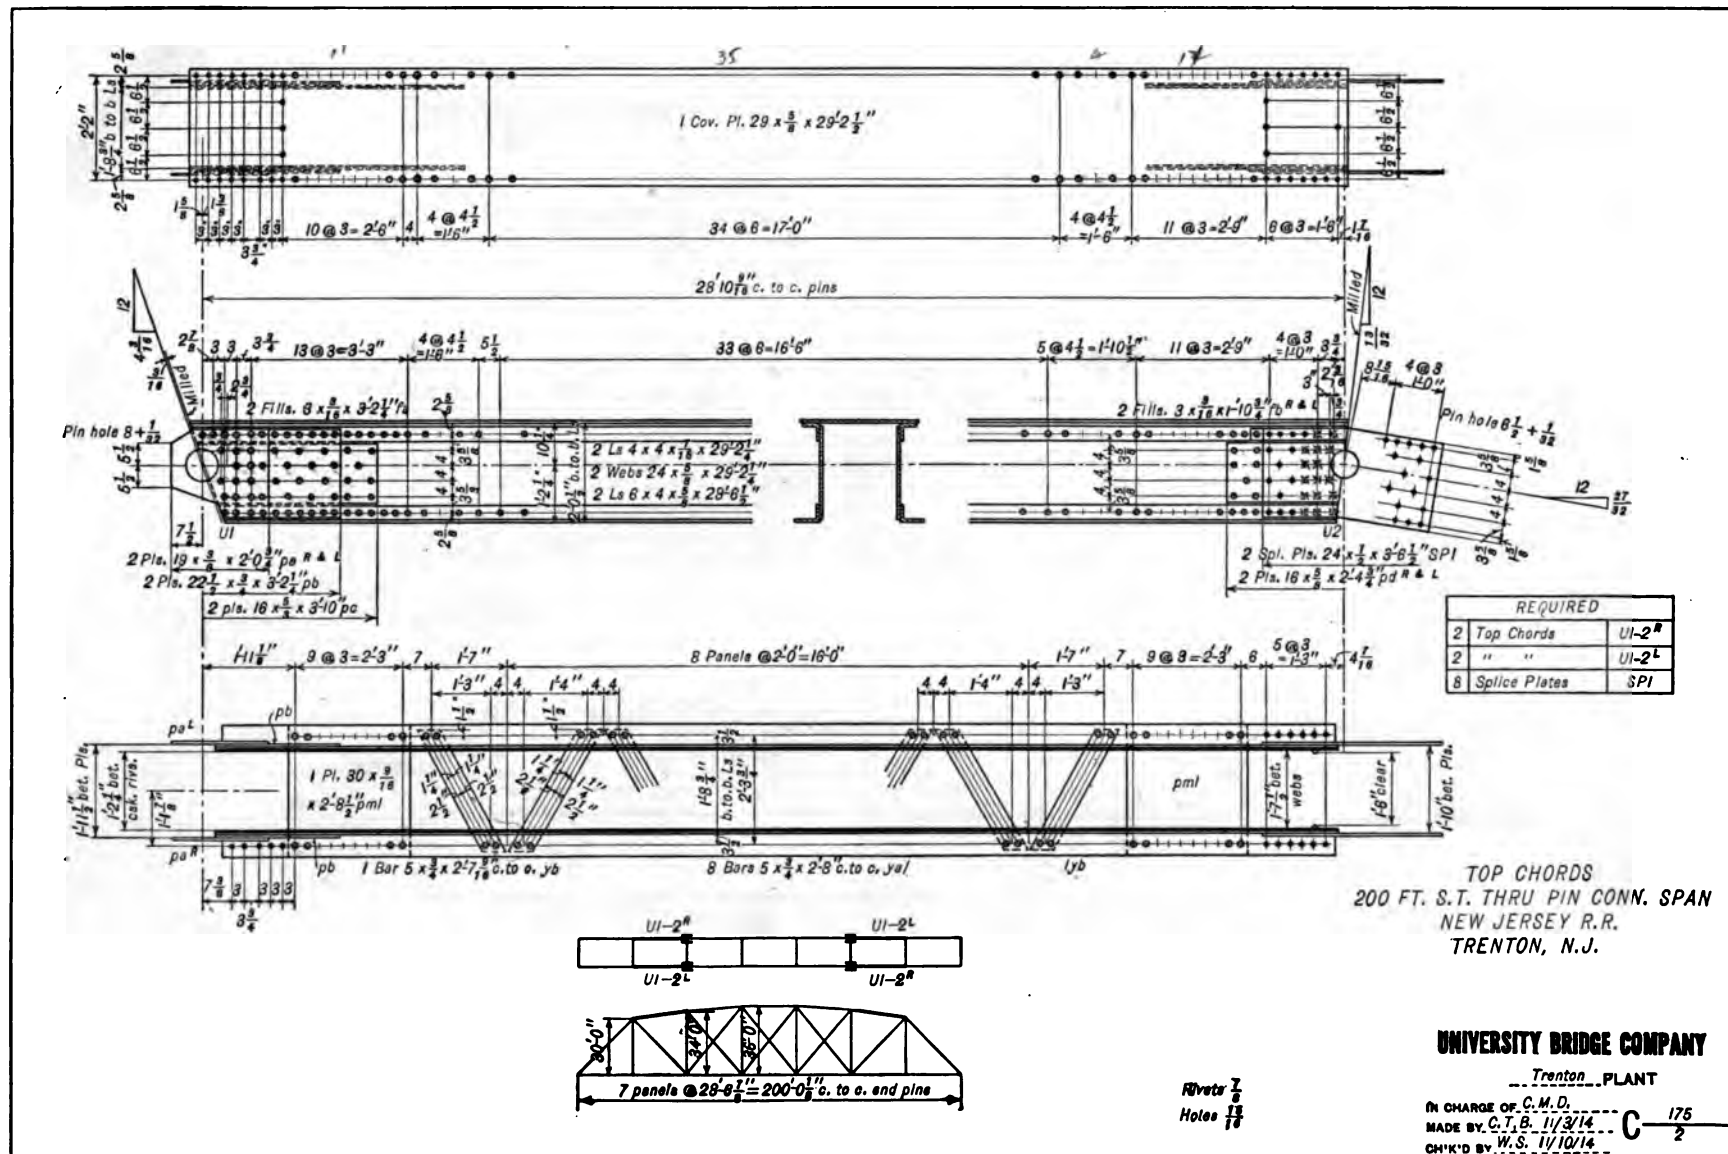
Top-chord Member for Pin-connected Truss of a Railroad Bridge.
